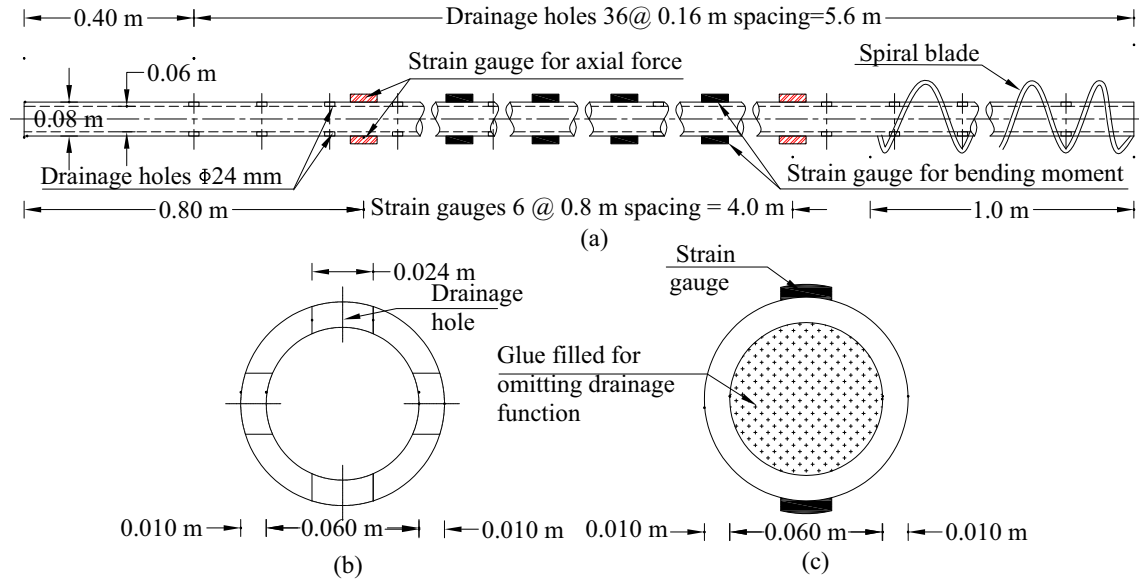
Steel drainage pipe (a) longitudinal section with locations of strain gauges and drainage holes; (b) cross-section of steel drainage pipe (c) cross-section of only reinforcement pipe with strain gauge.
